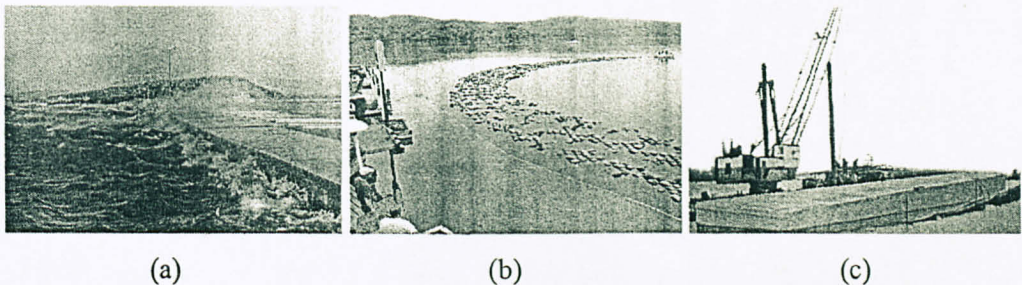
Types of floating breakwater. (a) Pontoon type floating breakwater. Designed and manufactured by SF Marina System Ab. (b) Mat type breakwater made from used tire in Lake Champlain, North America. (c) Box type floating breakwater Cowichan Bay, BC
